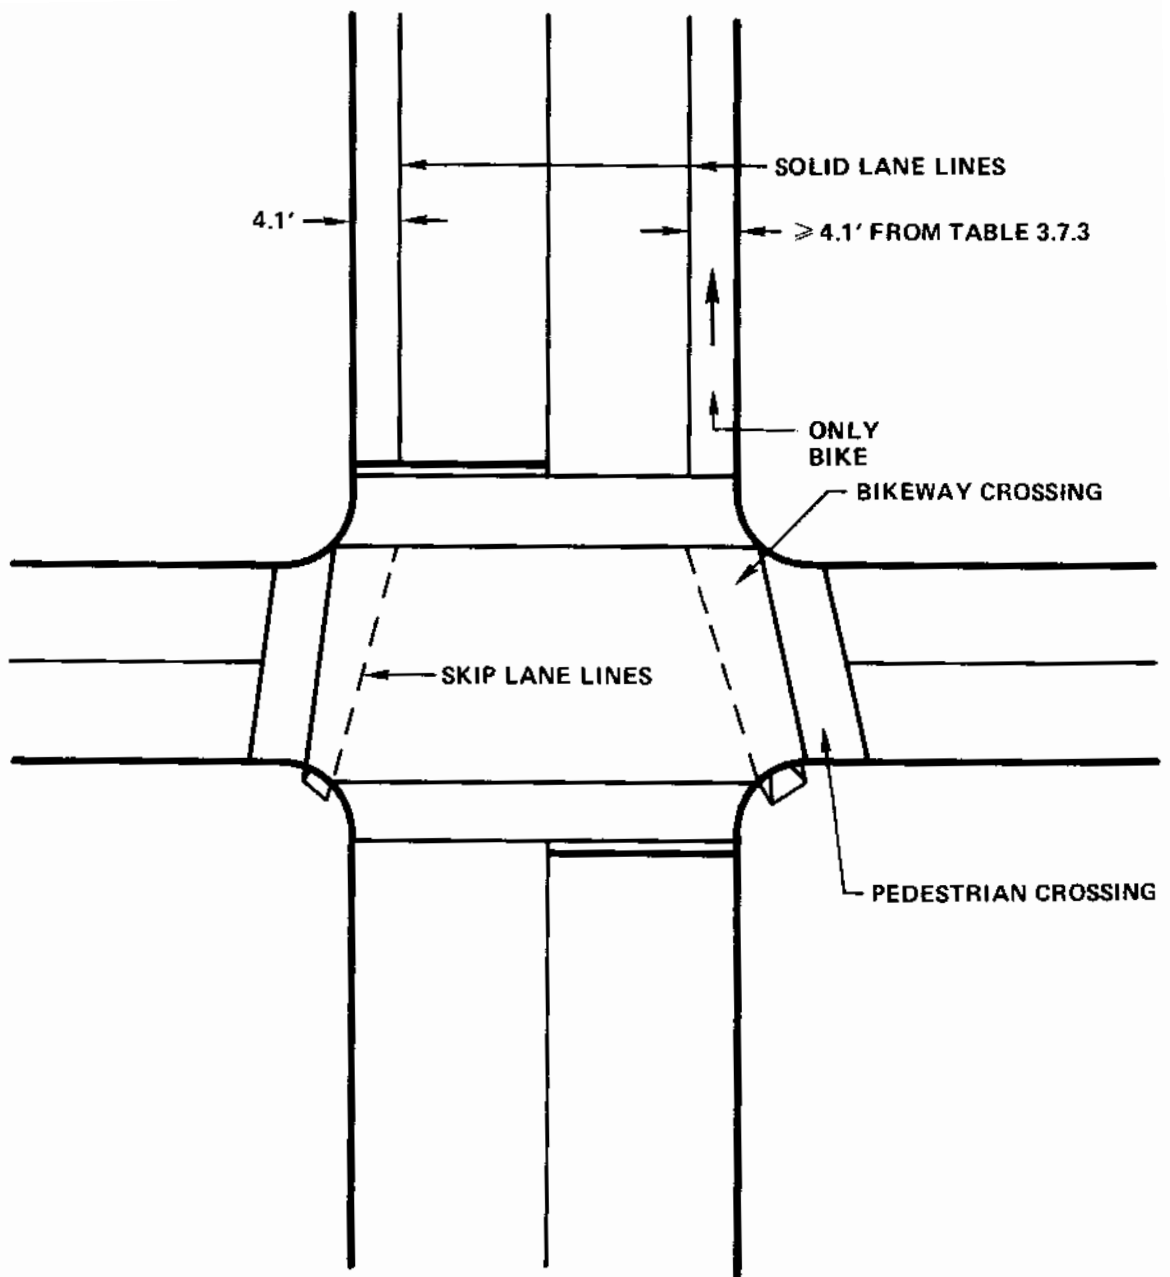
An Intersection Design where the Bikeway Changes from a Roadway Alternative to a Sidewalk Alternative at the Intersection.
